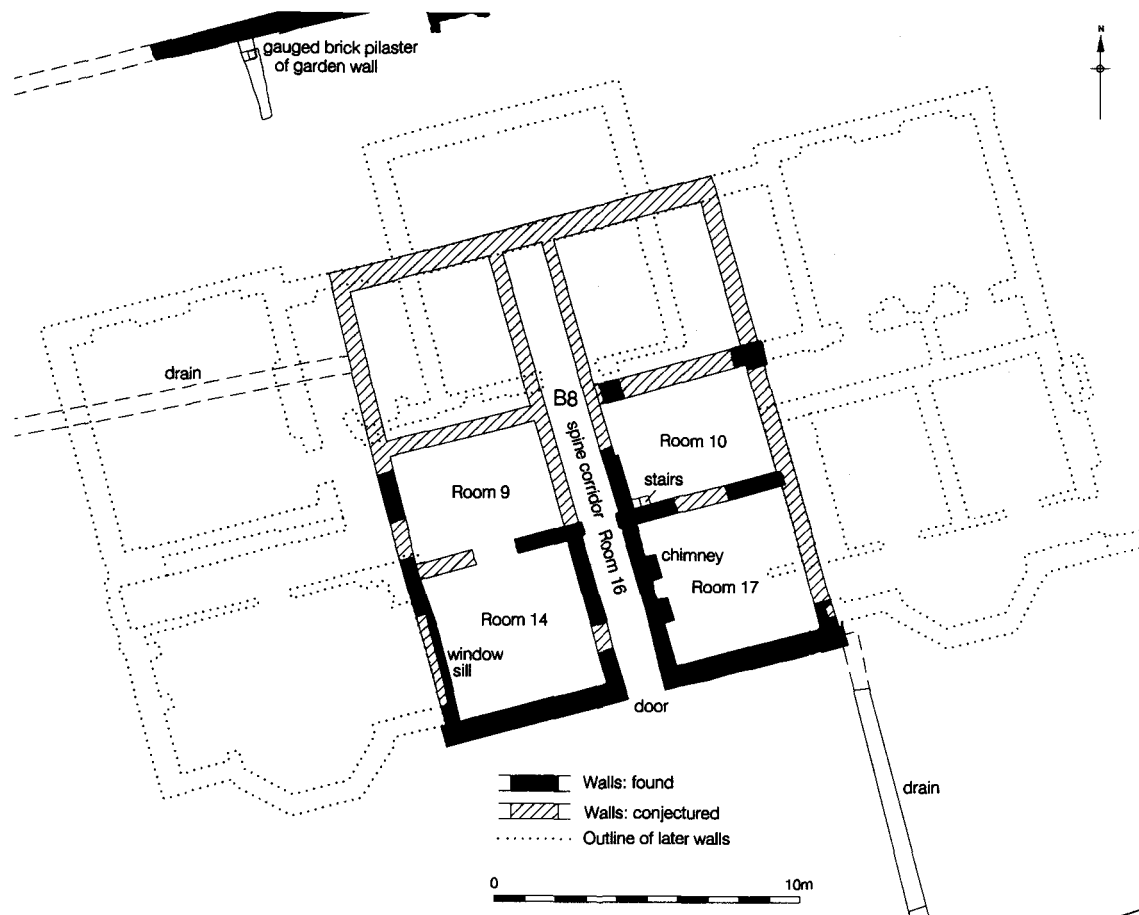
Phases 4 and 5: Building [B8] — floor plan interpretations (with outline of later building)
